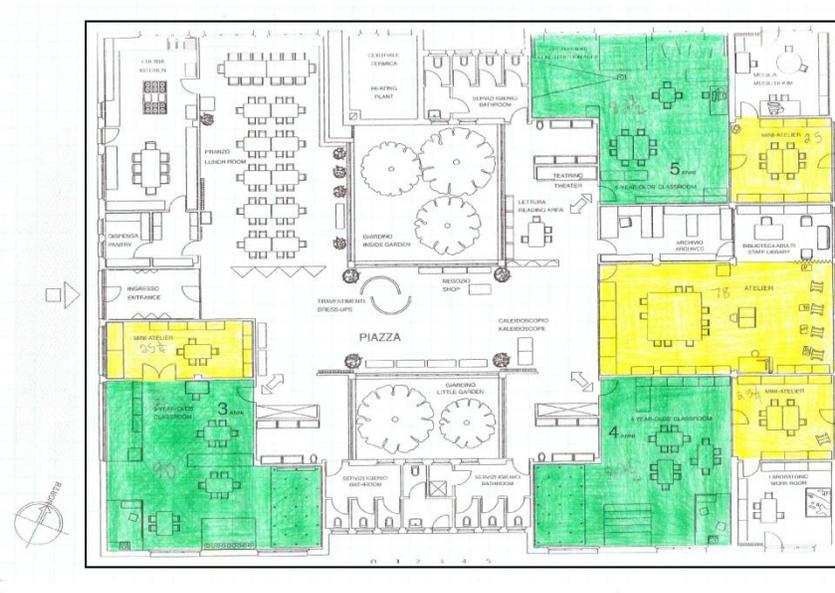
Diana School Floor Plan (Reggio Children, 2002, p. 6) comparing art and general classroom spaces.
